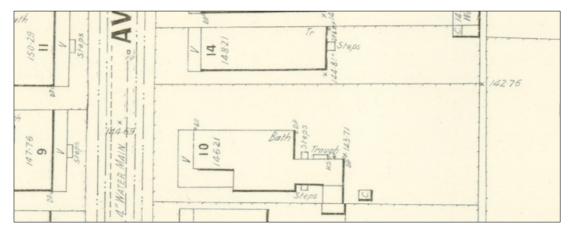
Extract from a 1903 MMBW Detail Plan. It shows the house at 10 Lofts Avenue to have been extended to the north at a later date, and also indicates that the boundary fences were timber – ie there is no evidence of a solid masonry fence between the two sites (as shown in figure 2). Source: State Library Victoria.
